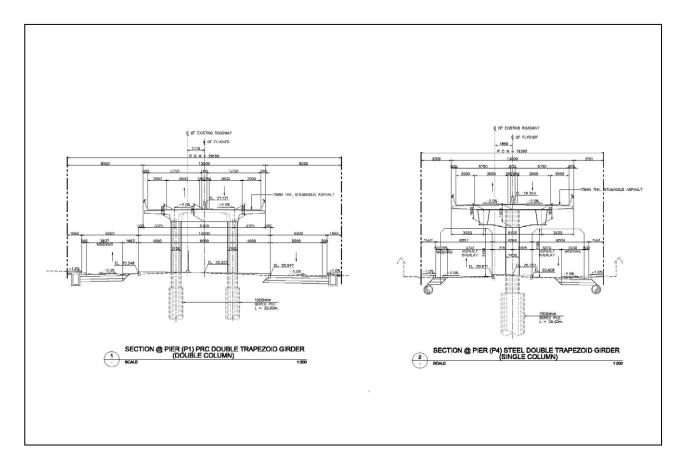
TYPICAL CROSS SECTION (BALARAJA)
